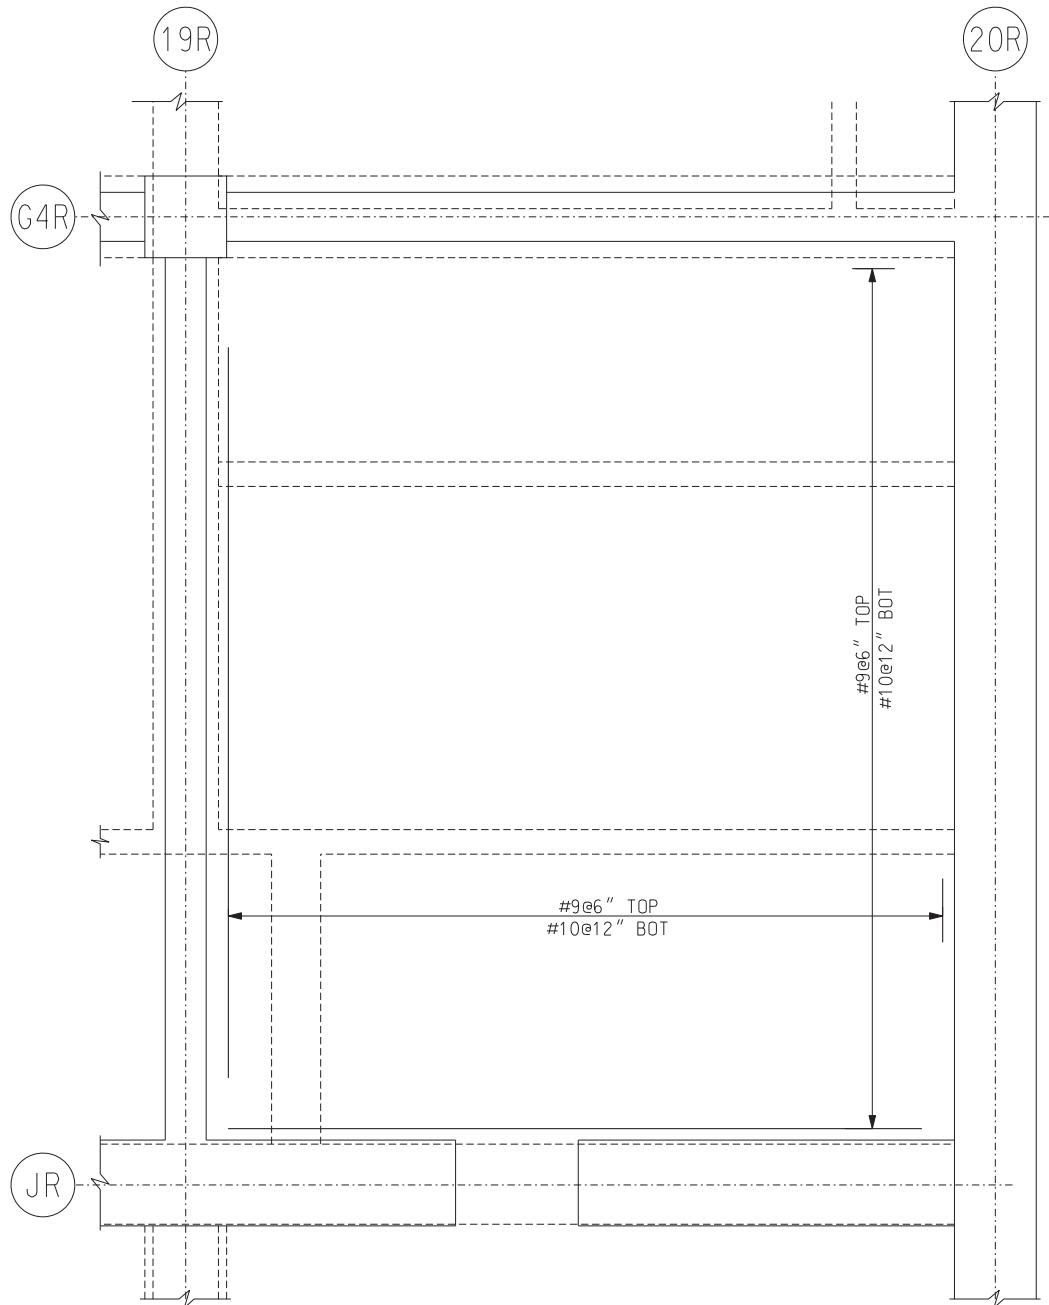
Typical Reinforcement in Floor at Elevation 3'-7"- AREA 1
